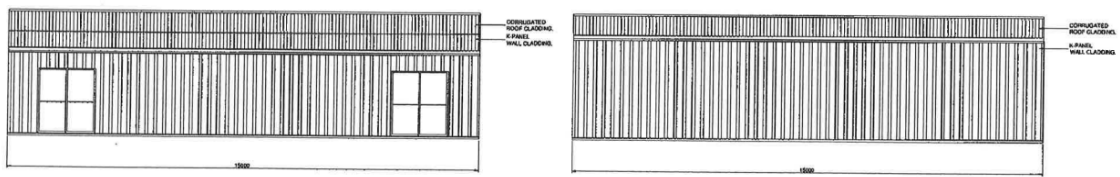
Elevations – North elevation on the left side and south elevation on the right.
